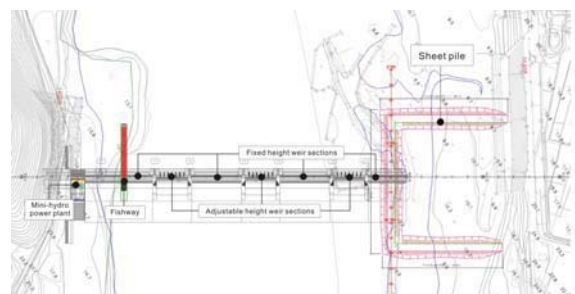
Cofferdam for construction of northeastern portion of proposed Dalsung Weir
